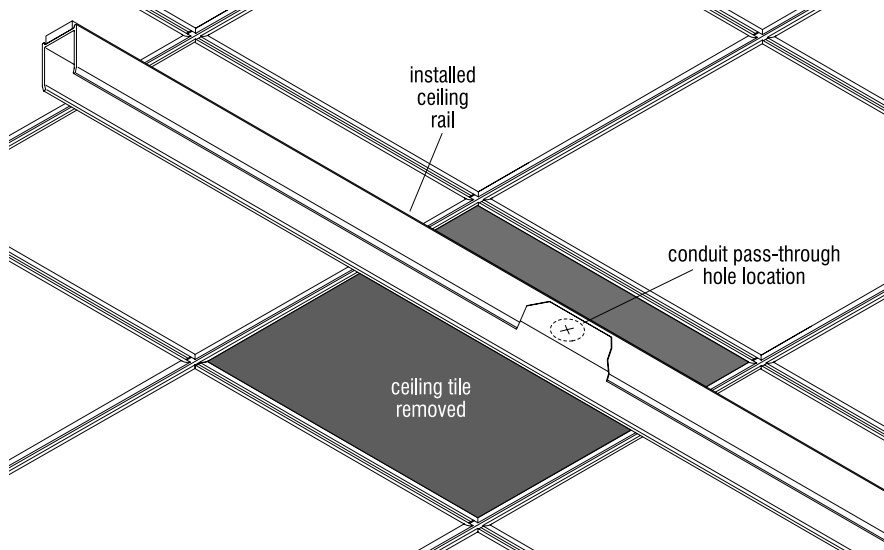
Conduit Pass-Through Hole Drilled From Under Ceiling Rail
